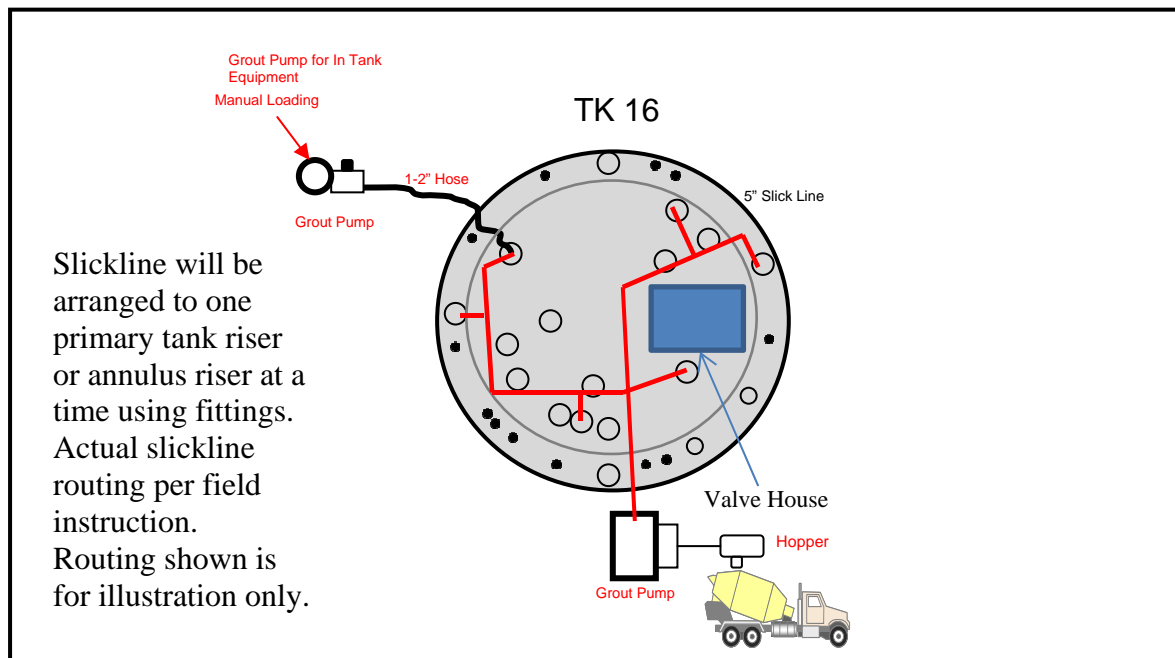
Tank 16 Typical Grout Equipment Layout
